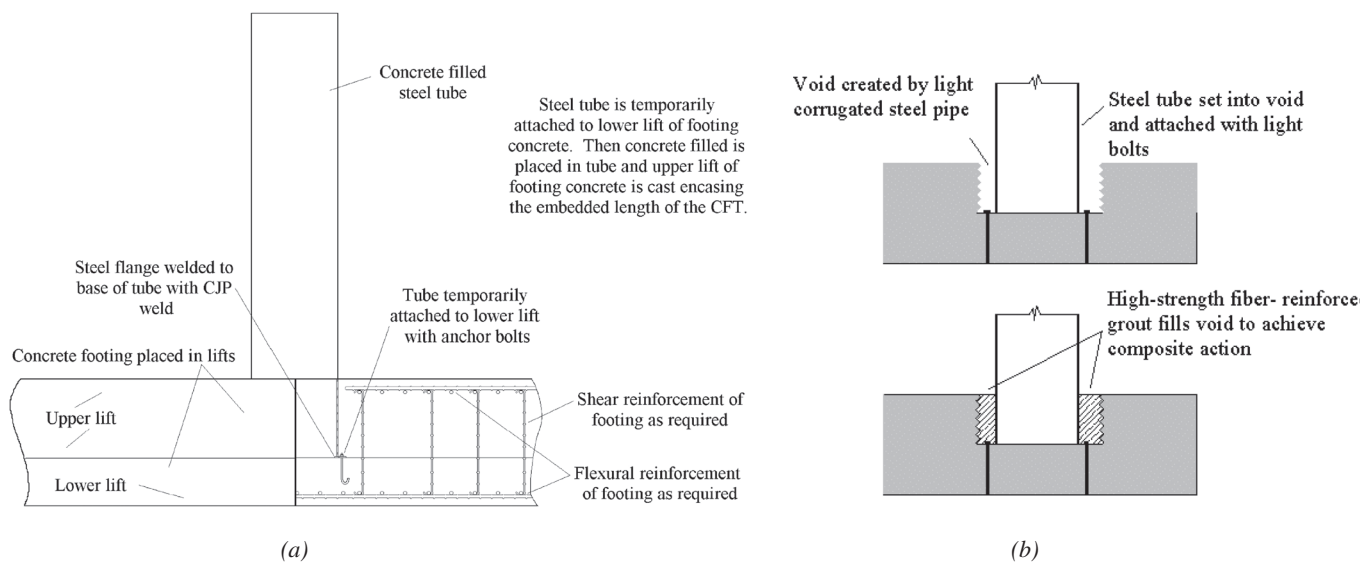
Proposed CFT foundation connections: (a) embedded type; (b) separated construction type.
